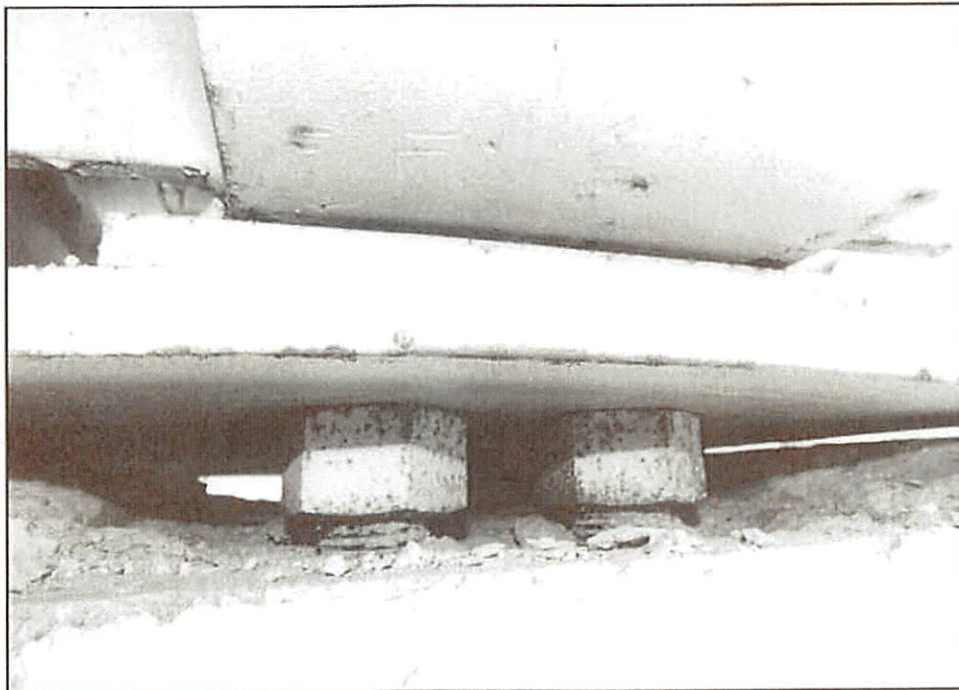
Light surface corrosion on the anchorage hardware and bearing plates at the slide bearing above the west column.
